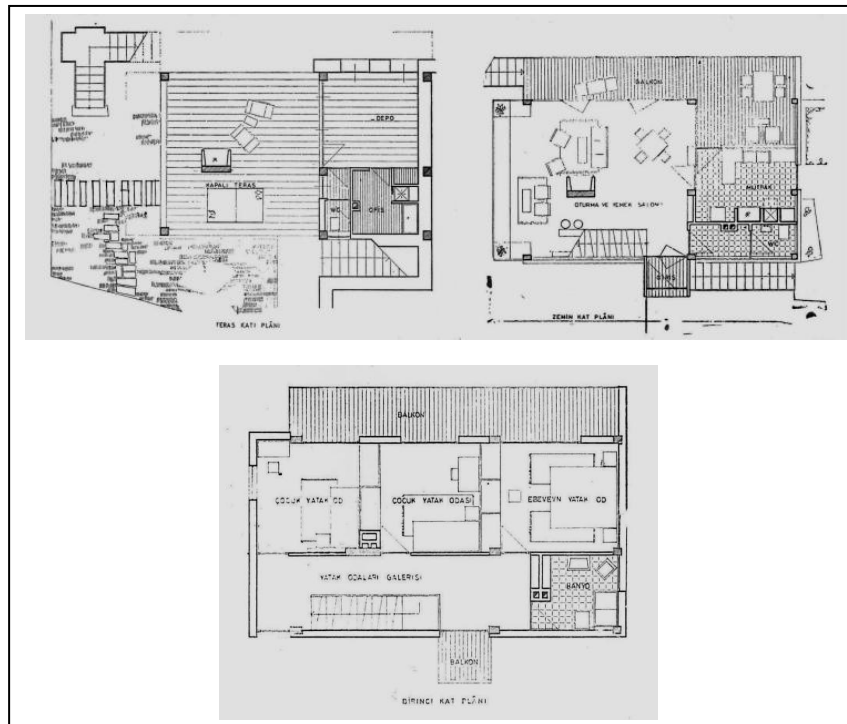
Floor plans of a summer house in Orhantepe, 1966 [151]
